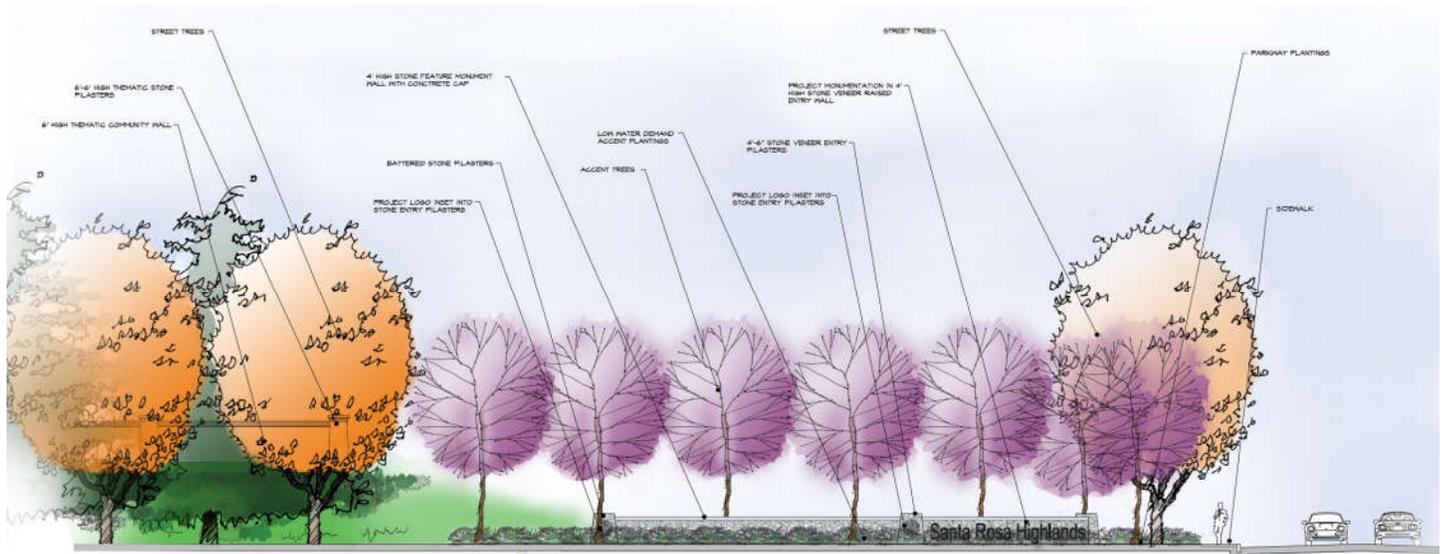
CONCEPTUAL LEMON STREET ENTRY MONUMENTATION ELEVATION5.6 STREETScape TREATMENTS
